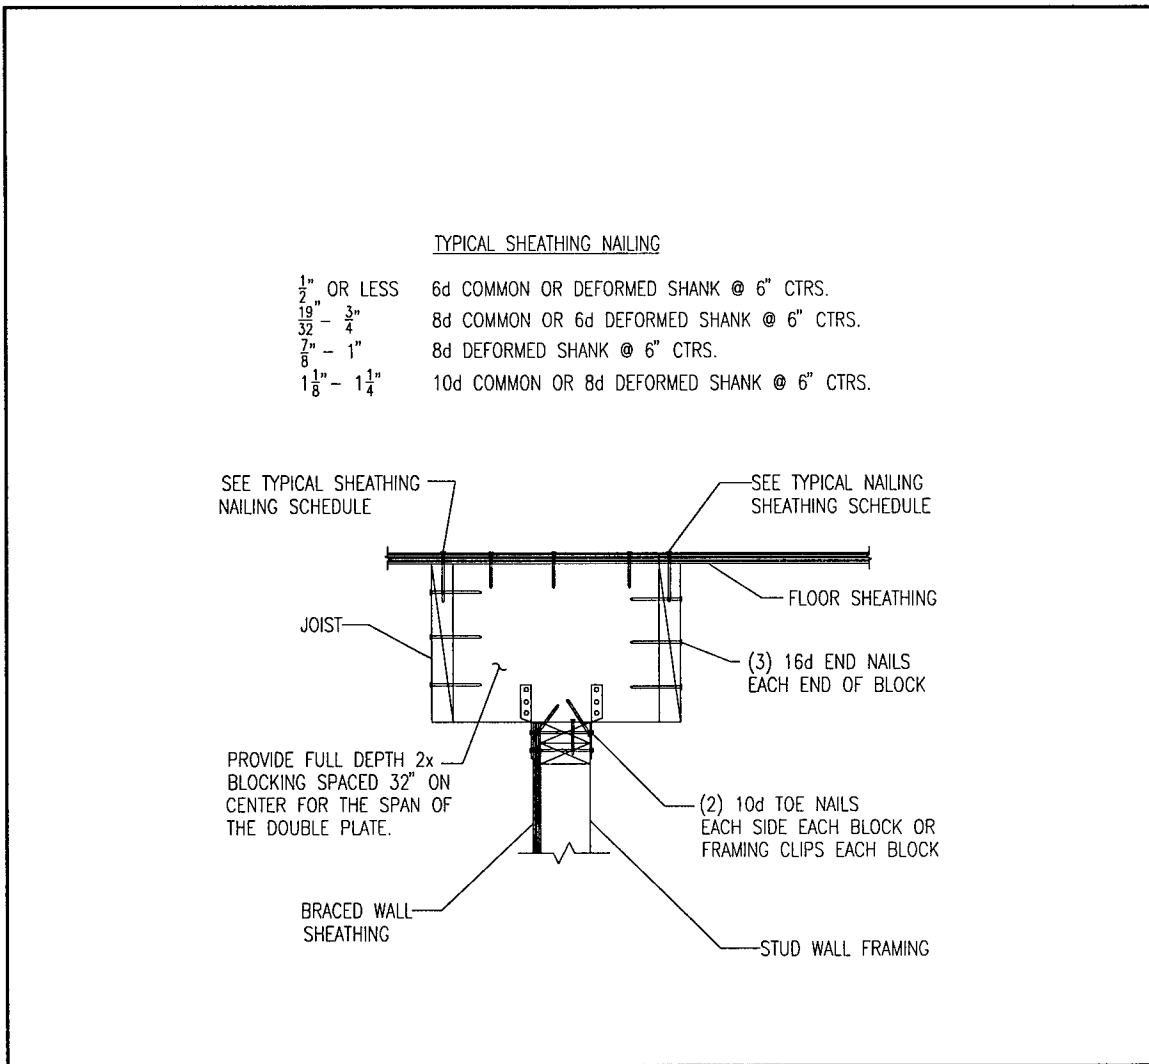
Interior braced wall at perpendicular joist.
